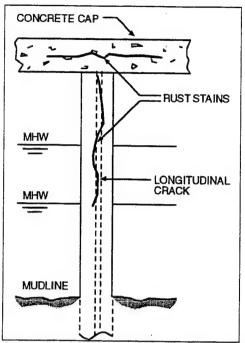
Longitudinal cracks in precast concrete pile due to freezing of cast-in-place jet pipe.
